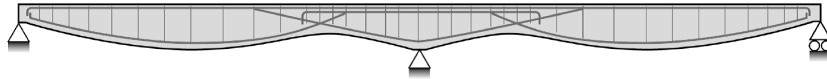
Complex steel reinforcement of optimised beam (Image courtesy: John Orr)
